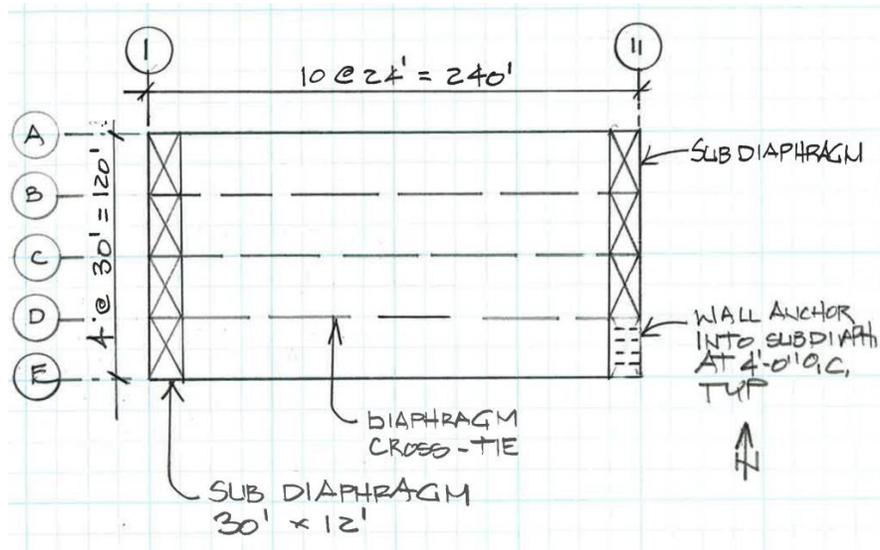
Plan of roof diaphragm with subdiaphragms for concrete or masonry wall seismic anchorage for loading in the east-west direction
